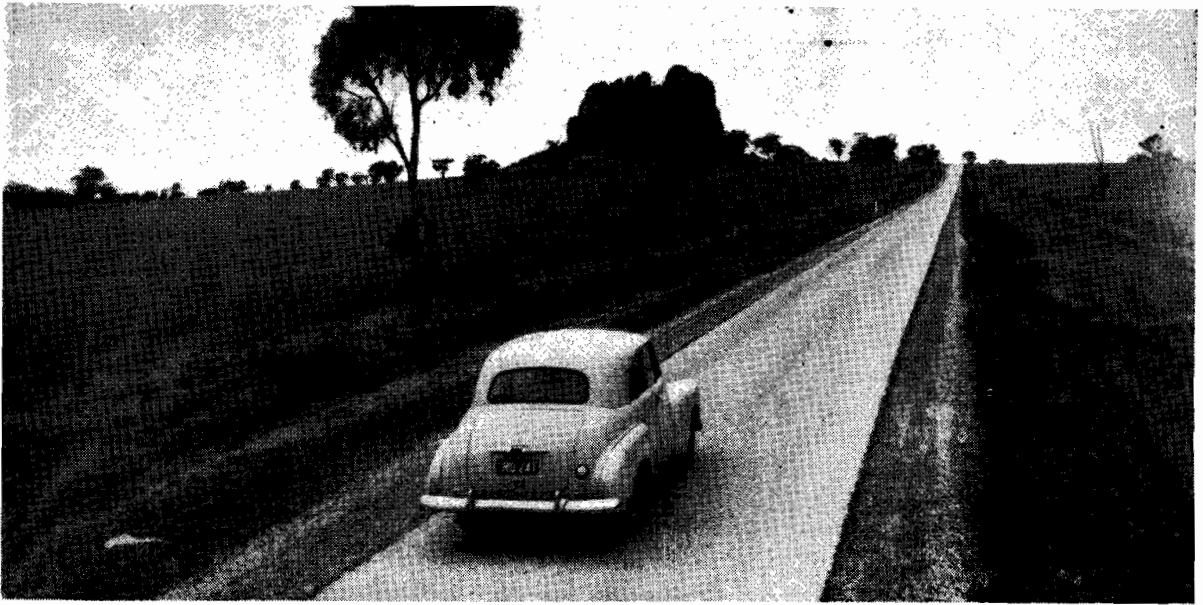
Apsley-Natimuk Road at Mitre Rock showing reconstruction and sealing.
